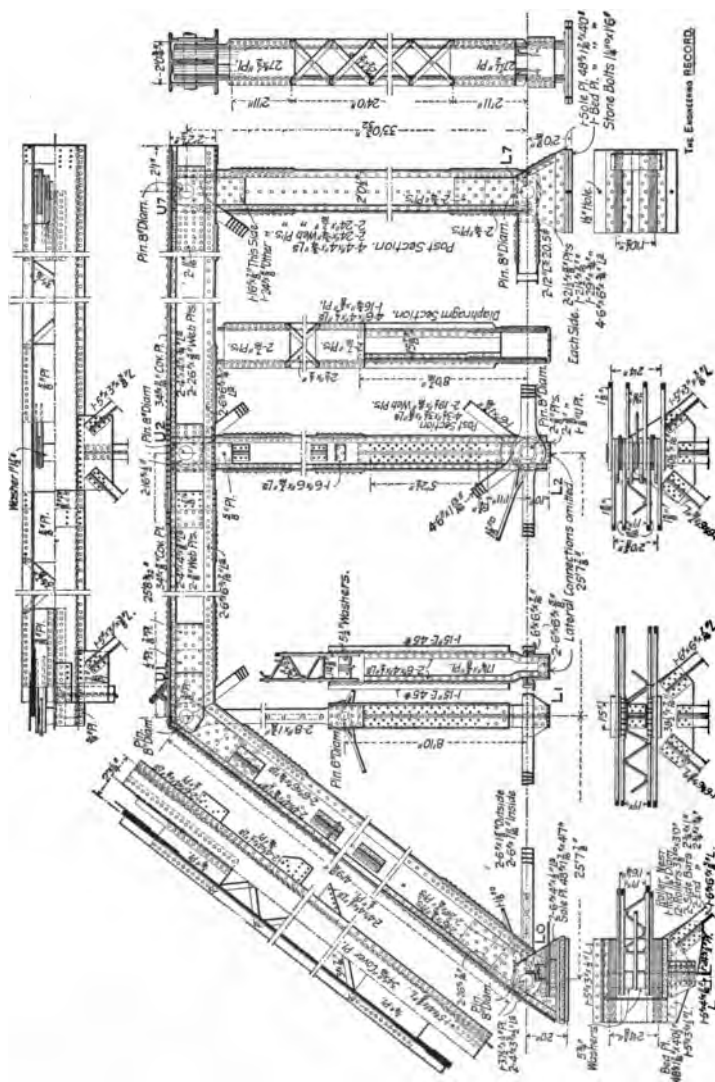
Union Railroad Double-track Through Bridge over the Pittsburgh, Virginia and Charleston Railroad at Port Perry, Pa. Span, 177½ feet. Built in 1897. See references to various details in Arts. 73, 74, 77, 79, 81, and 96
